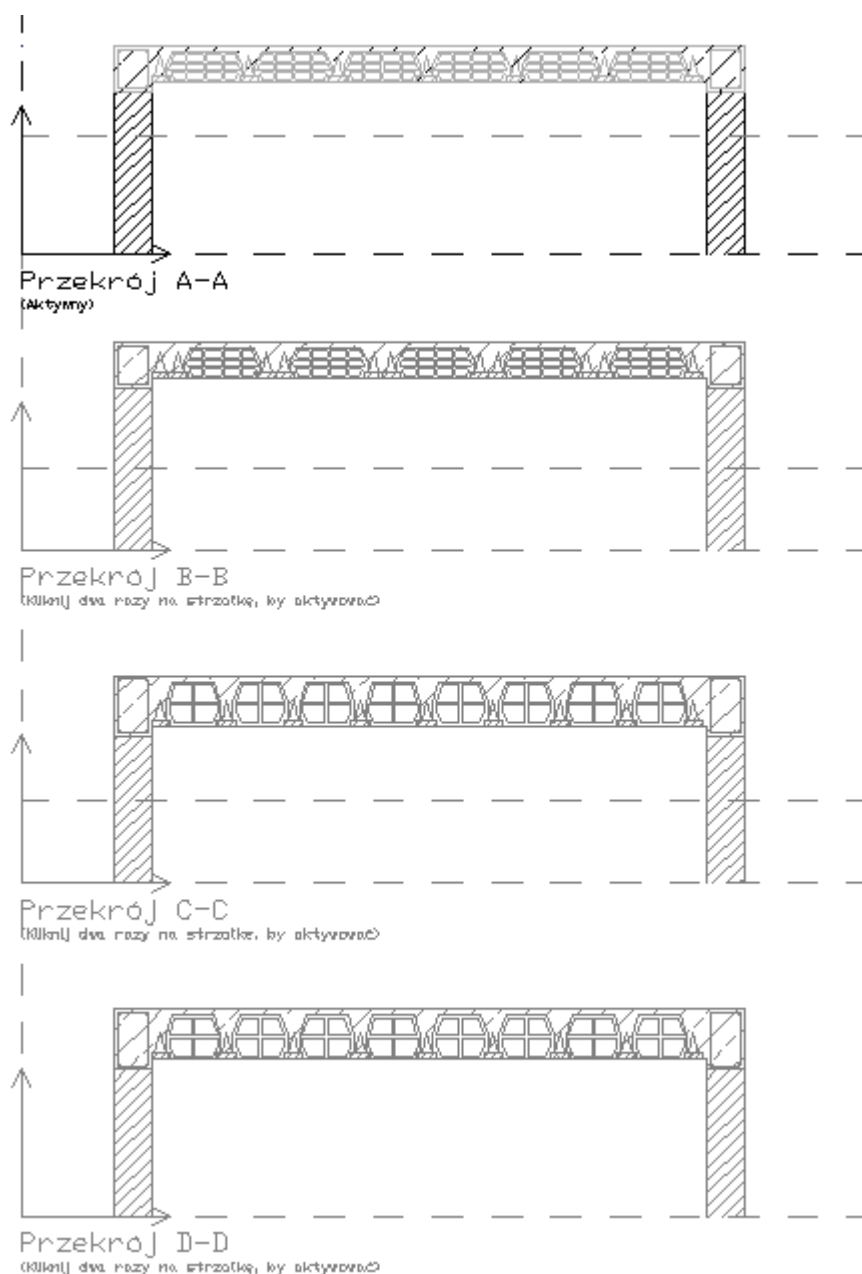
Examples of airbricks arrangement for different types of ceilings and their entablature
